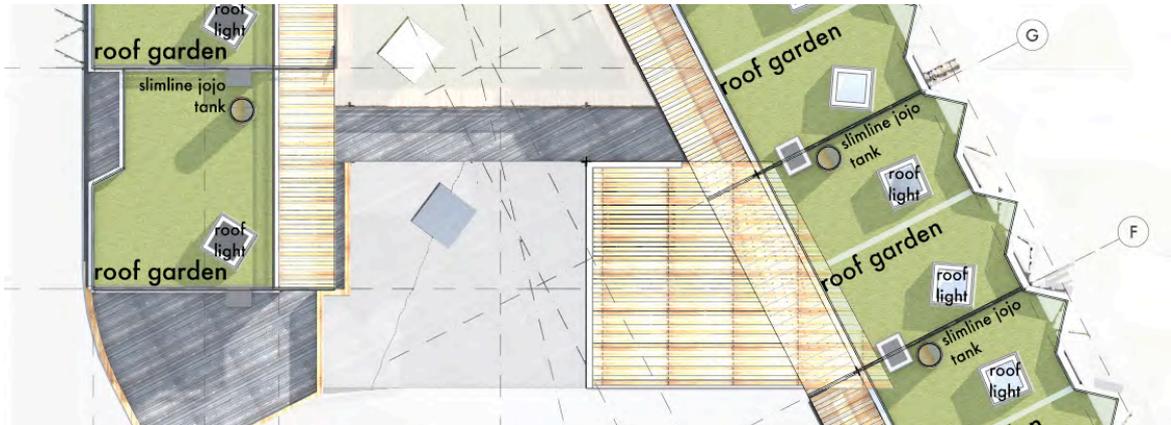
Detail of the lofts and their green roofs, also showing the roof lights and jojo tanks.
